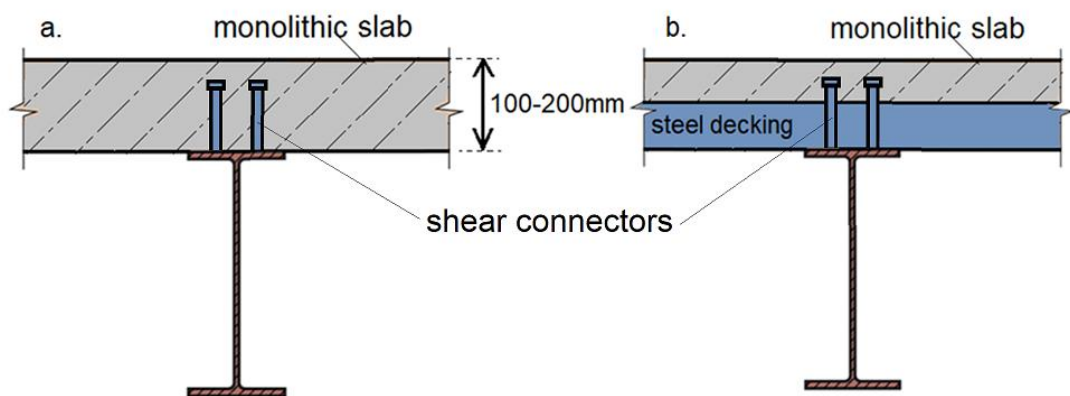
Structural solutions of the composite floor with cast-in-place concrete slabs: a. made with inventory formwork; b. with steel decking as a permanent formwork
